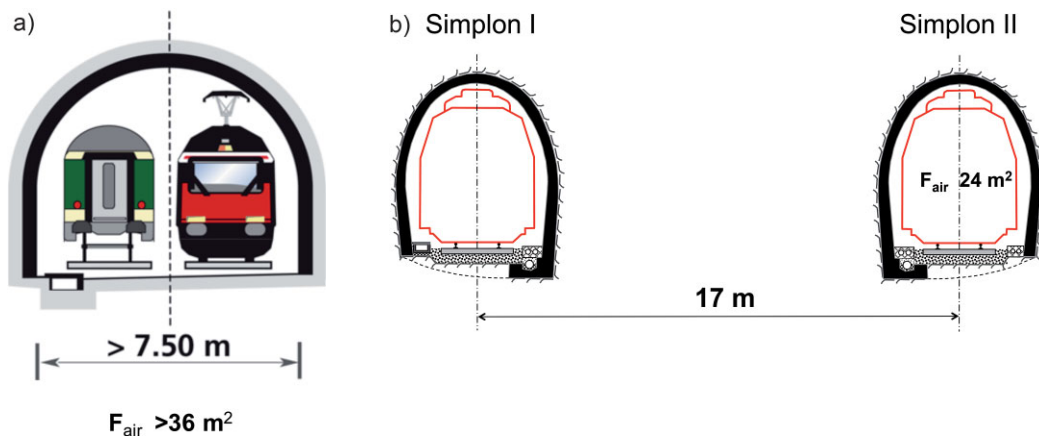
Tunnel cross-sections of historic long rail tunnels in the Alps: a) Gotthard rail tunnel (1882) (Quelle; ATG), b) Simplon Tunnel (1906/1922) Bild 1. Tunnelquer-schnitte alter langer Eisenbahntunnel in den Alpen: a) Gotthard-Eisenbahntunnels (1882) (Quelle; ATG), b) Sim-plontunnel (1906/1922)
